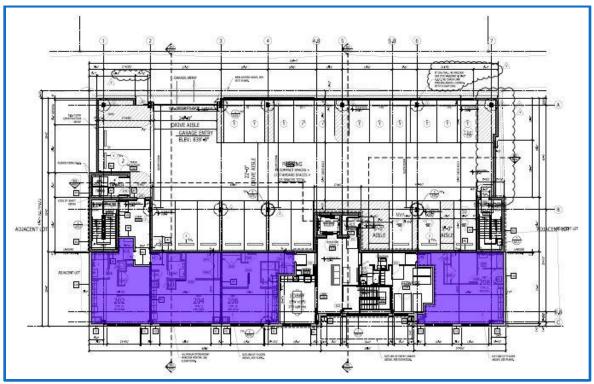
Existing Rentable Space at 2<sup>nd</sup> Floor
